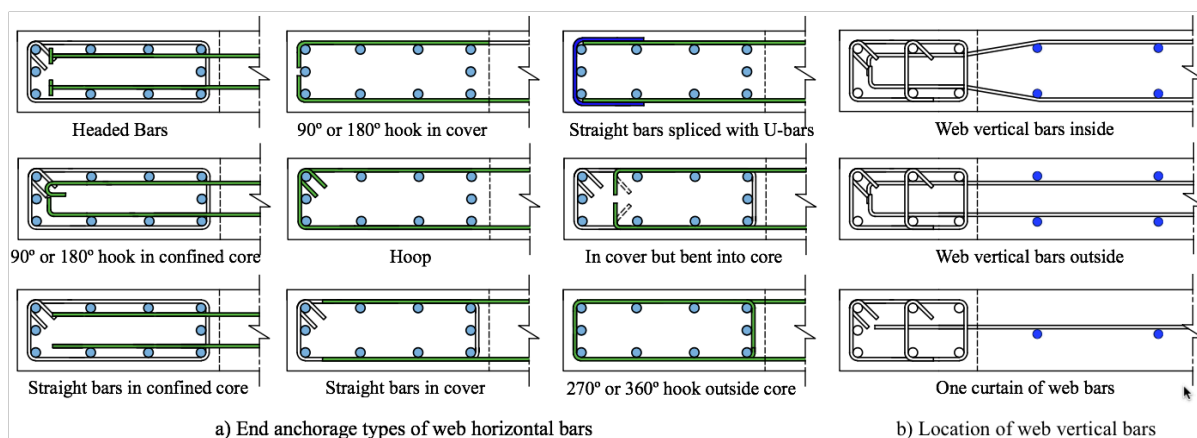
Examples of wall web details parameterized in UCLA-RCWalls.
